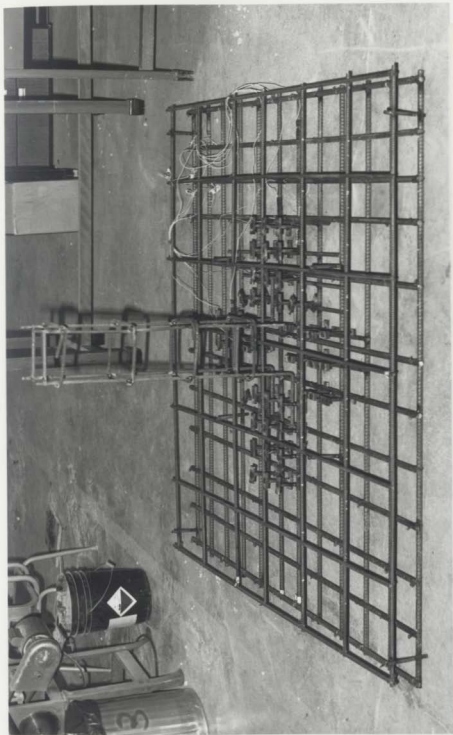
T-headed shear reinforcement in construction (Slab HS23)
